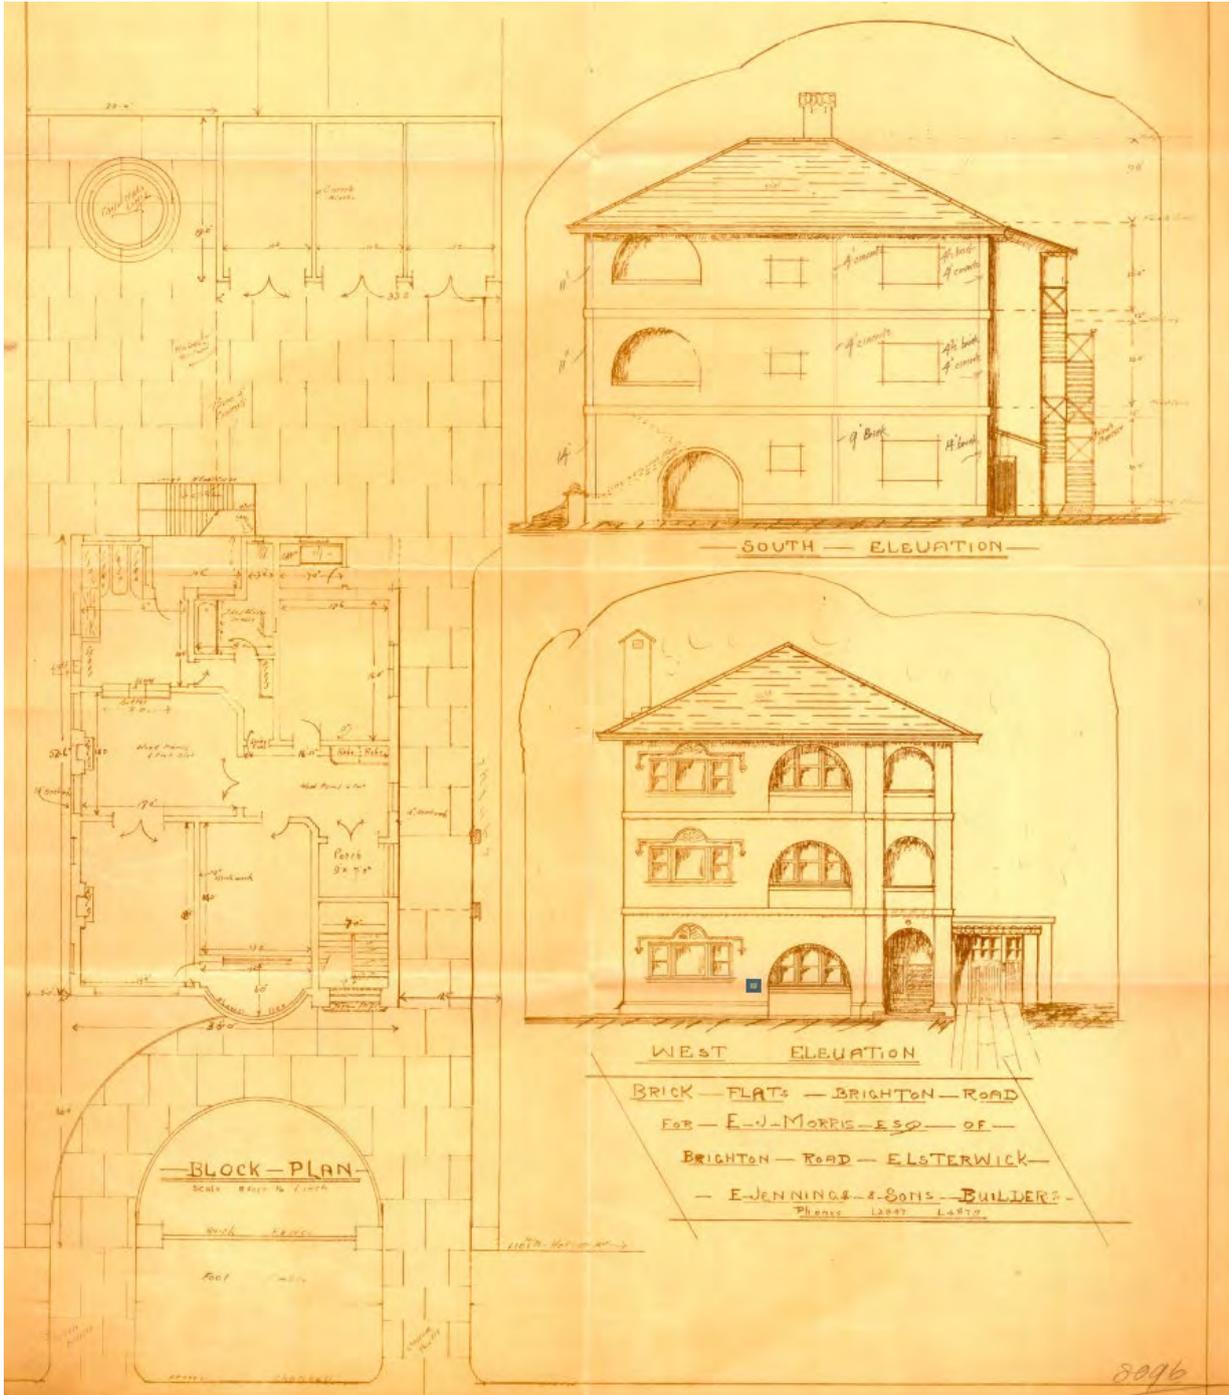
1932 building permit plans and elevations for the flats at 122 Brighton Road. Note the curved front drive and garages at the rear. (Source: St Kilda Council Building Permit no. 8096, 27 July 1932)
